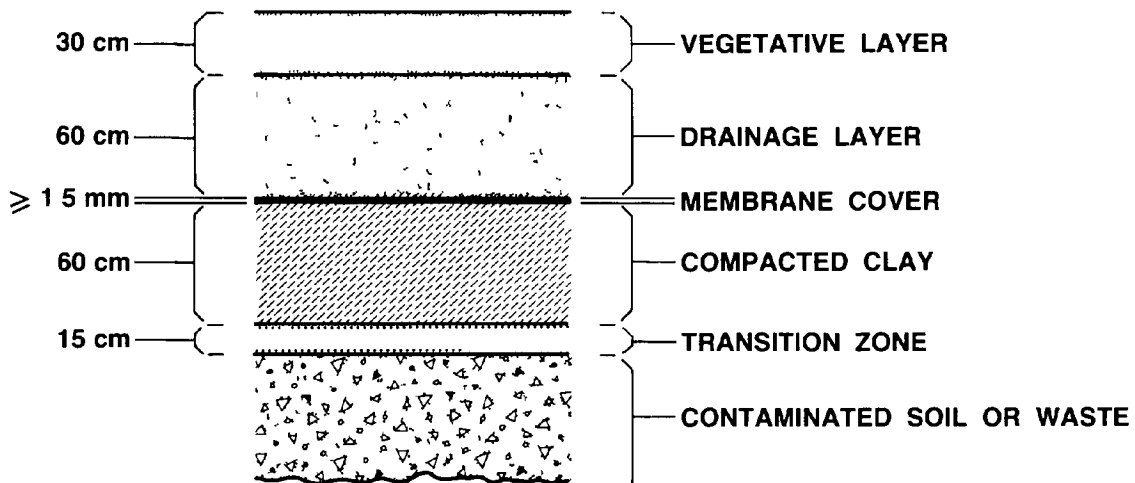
Cross-section of Cell Cover for Impermeable Hazardous Waste Cell (Maximum Security Type, LaSalle, Quebec)
